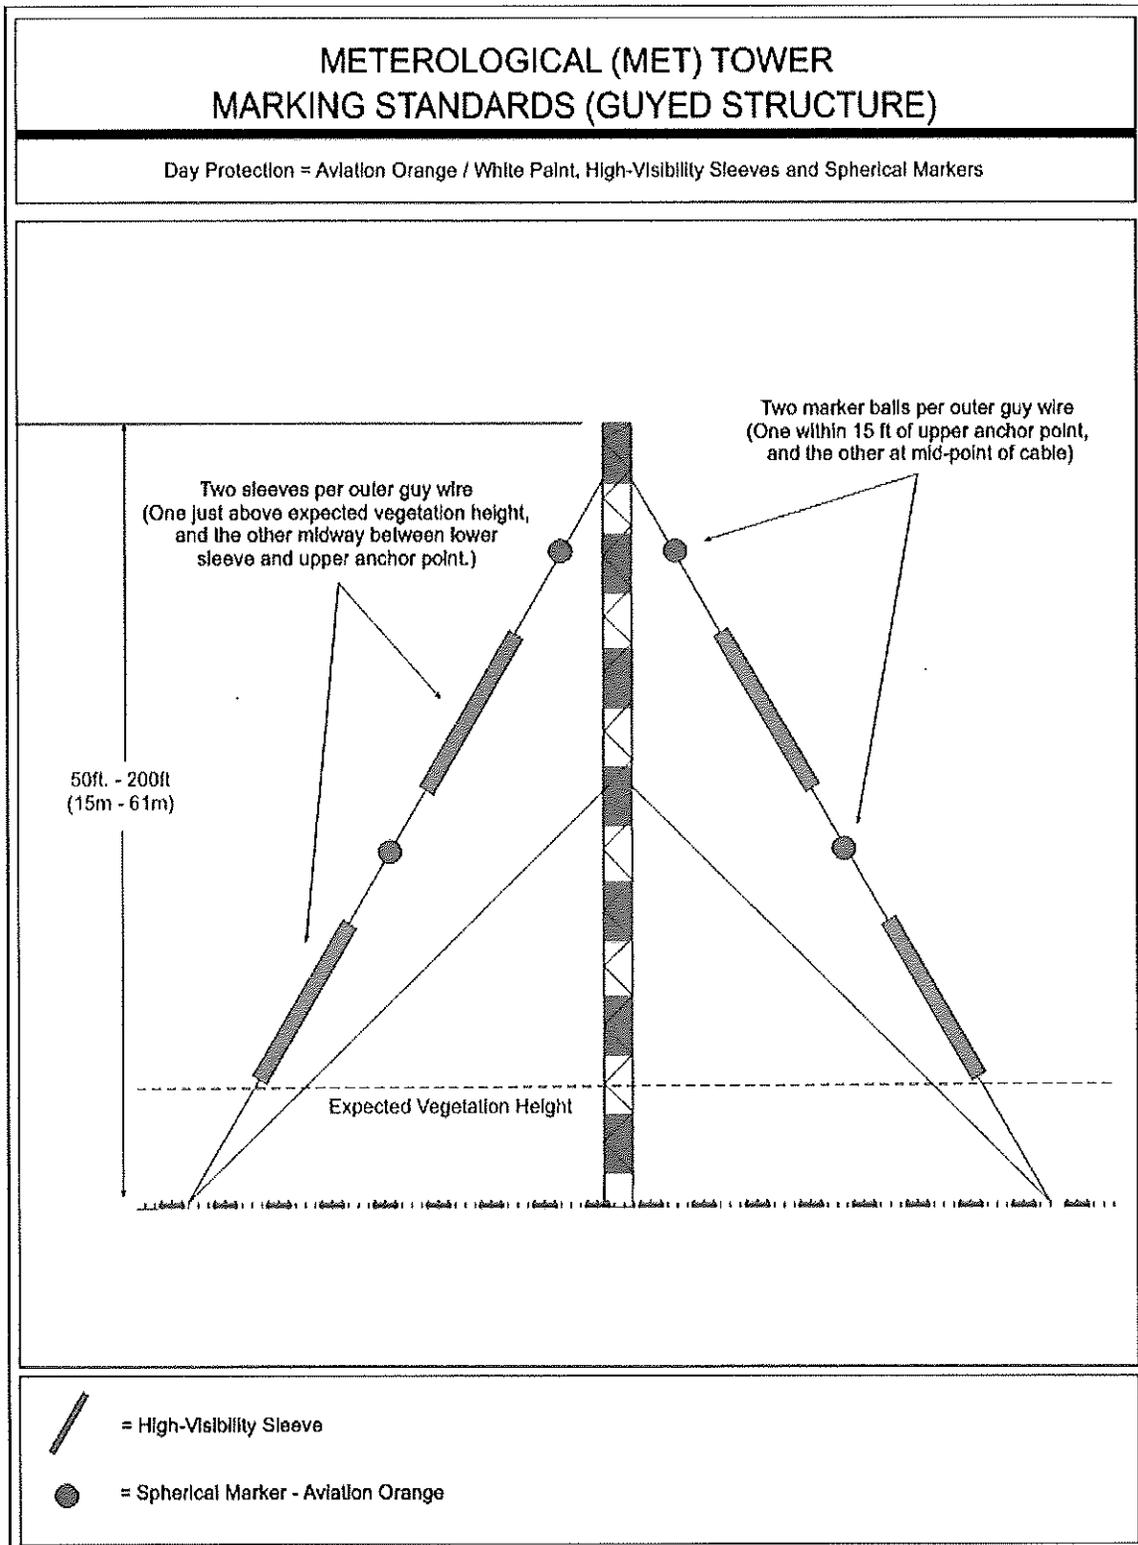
Meteorological (MET) Tower Marking Standards (Guyed Structure)
